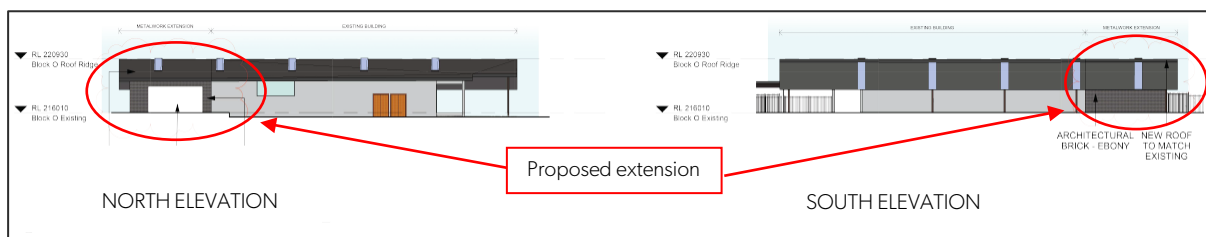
| Proposed north and south elevations of the metal works building extension (source: Section 4.55 Modification Application, 2019)
